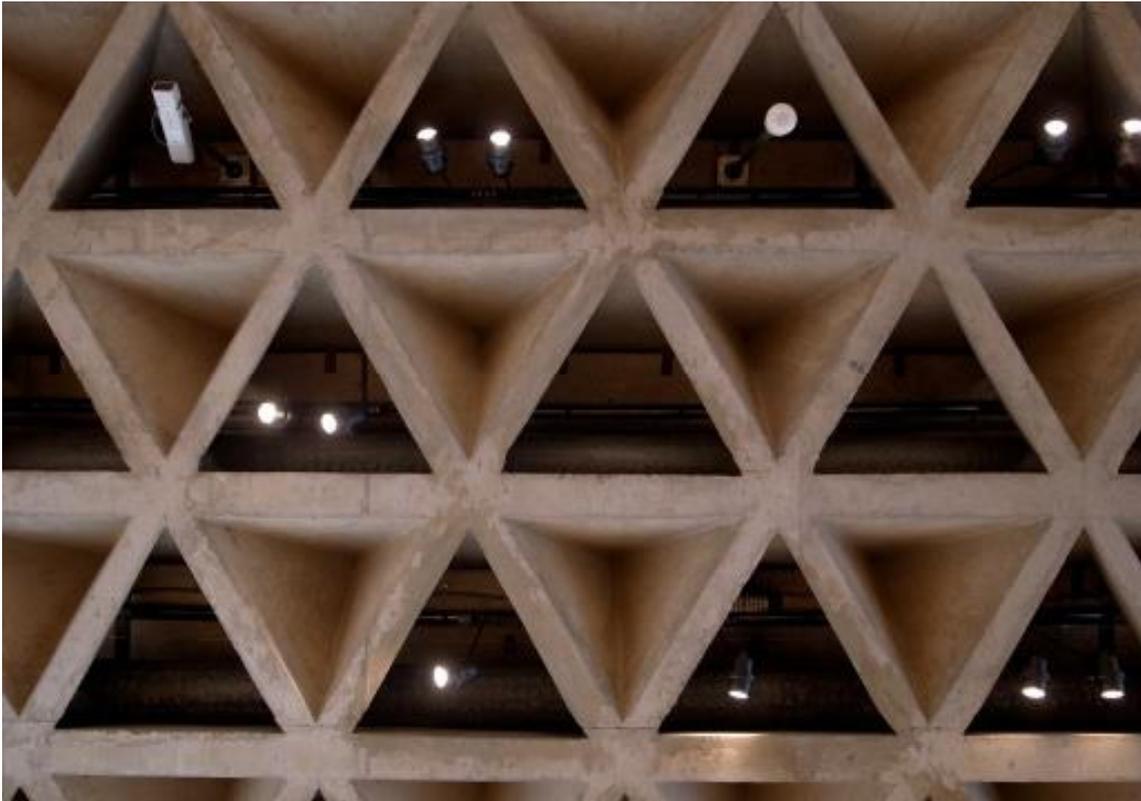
The tetrahedral ceiling plan of the Yale Art Gallery
